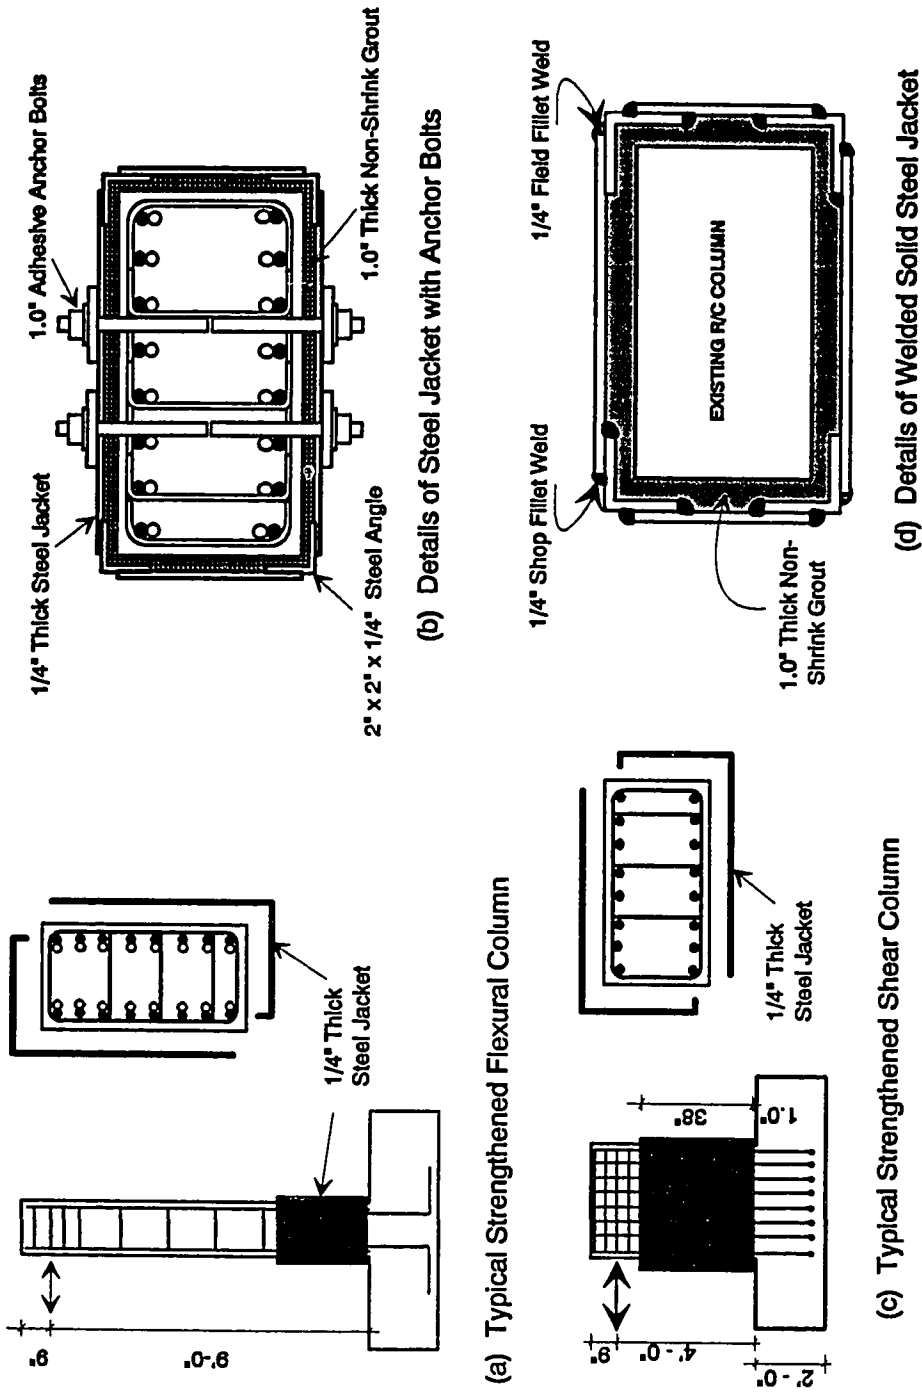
Details of Columns Strengthened with Steel Jackets
